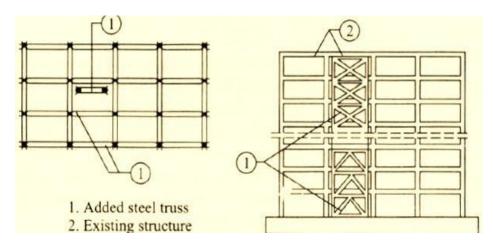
Reinforced Concrete Building retrofitted by steel bracing
